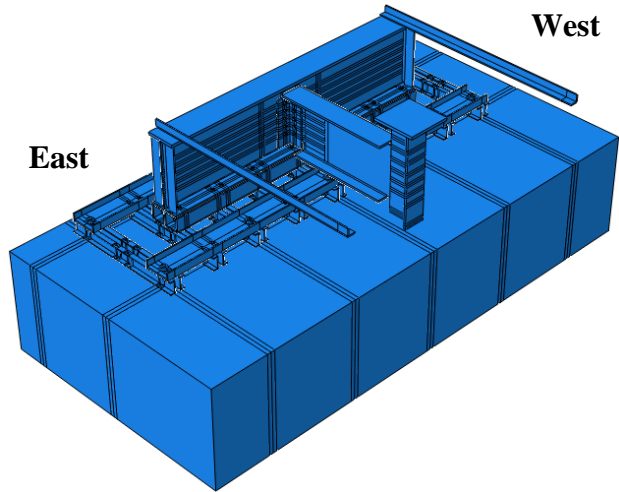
Finite element model for double-angle connection with shorter floorbeam web
